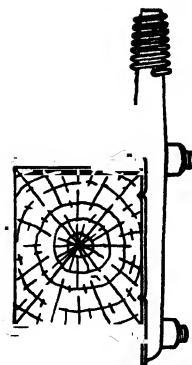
Steel clamp pin. (Courtesy Hubbard & Co.)
